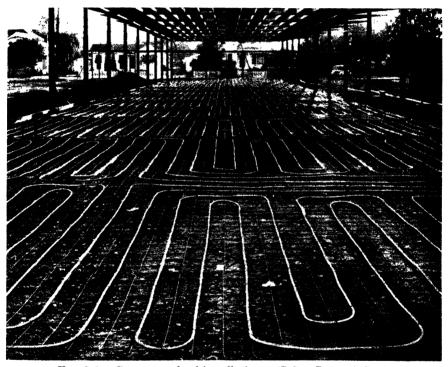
Grammer-school installation. (Robert Bruen & Son.)
